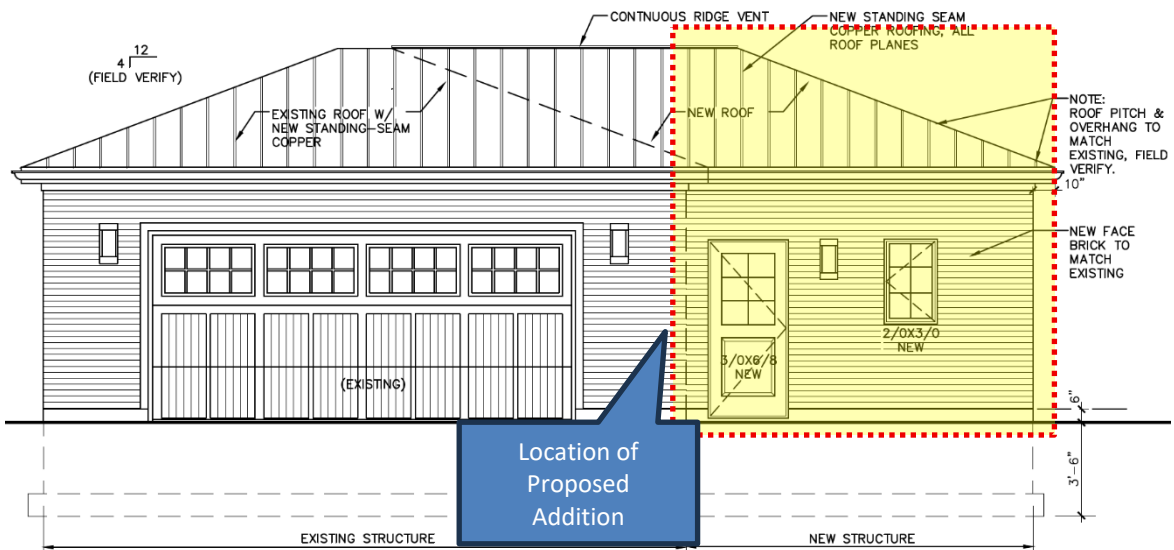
Subject Property – Proposed garage addition front (west) elevation rendering
